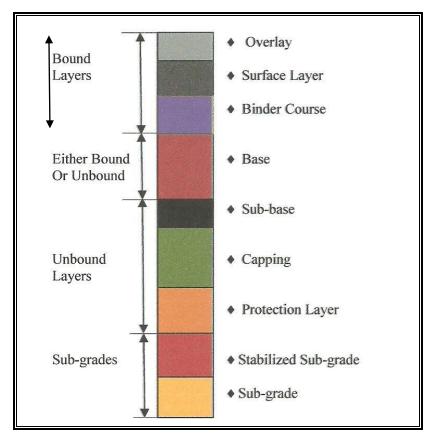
Proposed Pavement Structure for the East-West Coastal Road, Segment 3: Section C. (adapted from the COST REIPAS Project, 2005)
